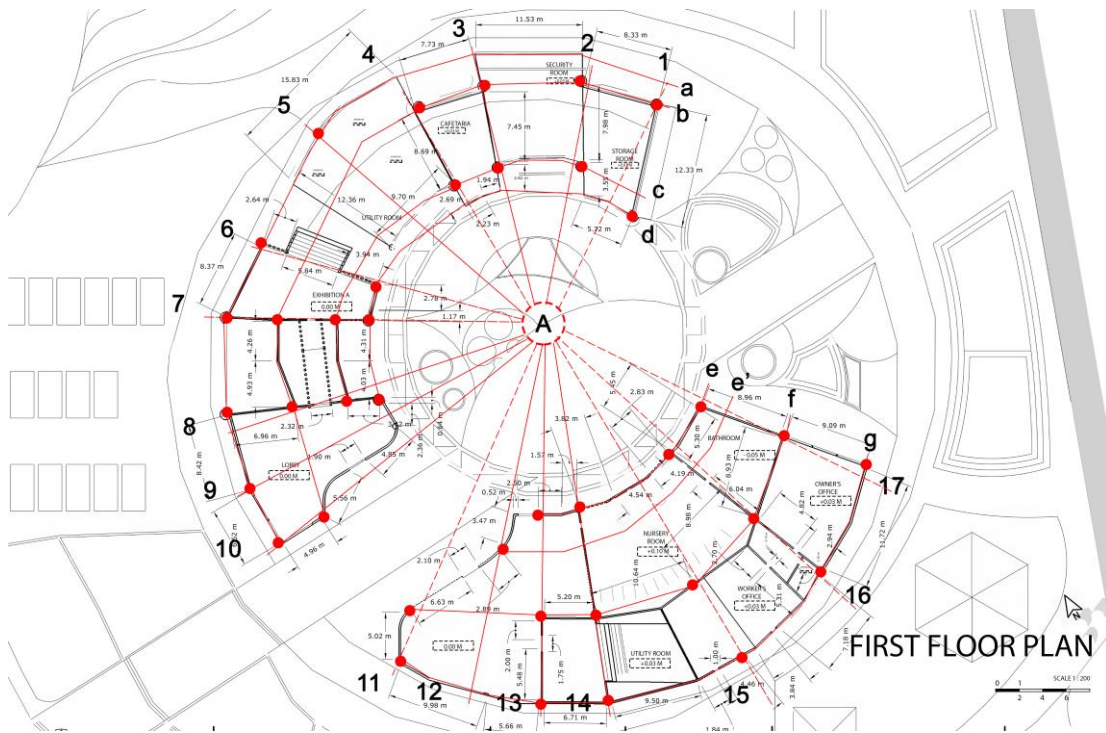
First Floor Structure Plan (Source: author analysis)
